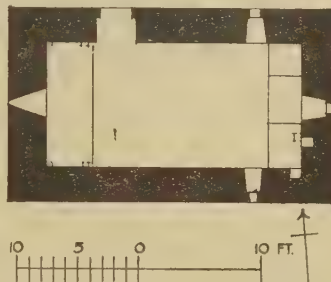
Chapel, Rudh' an Teampuill (No. 108).
